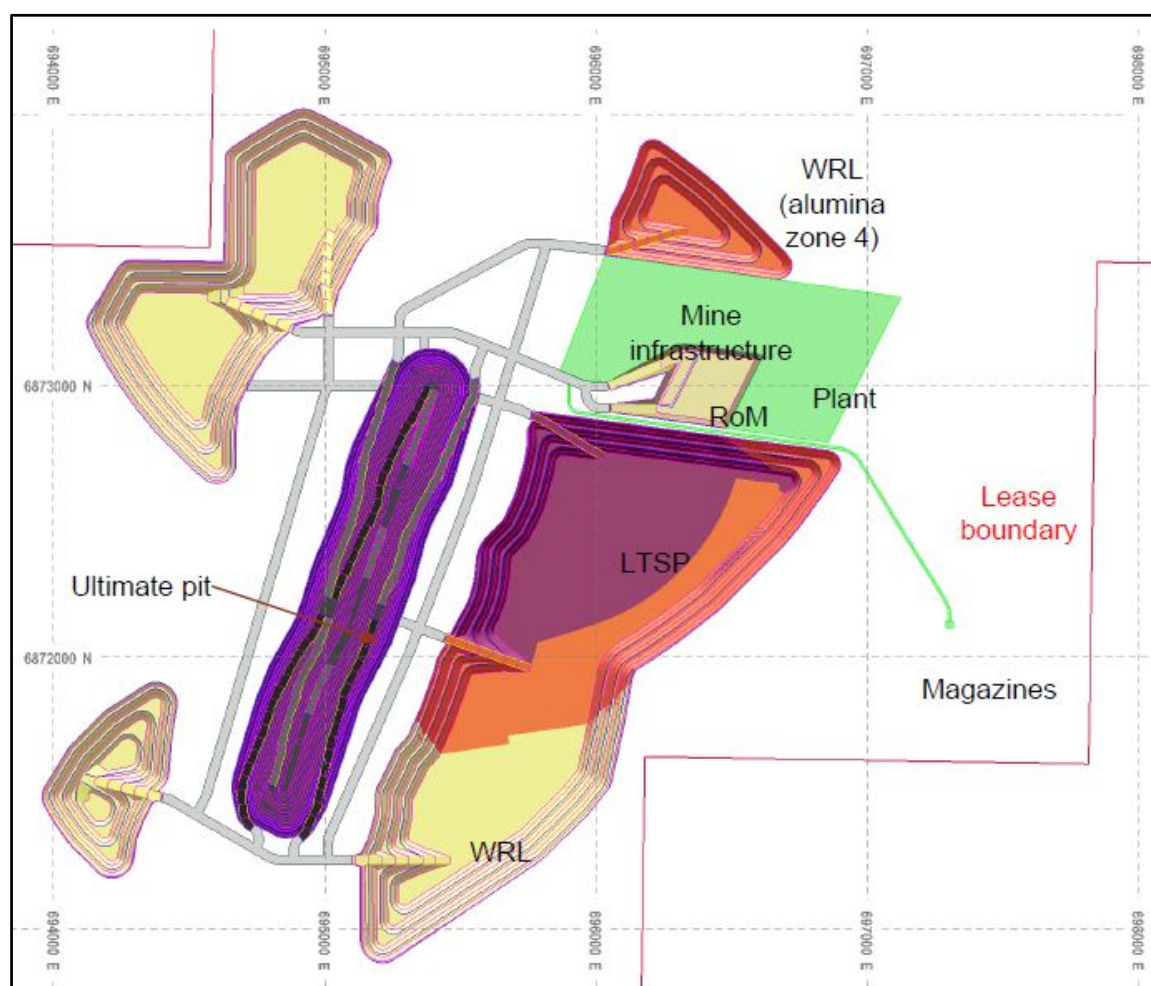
Overall mine layout with final pit design. WRL: Waste Rock Landform, LTSP: Long Term Strategic Stockpile.
